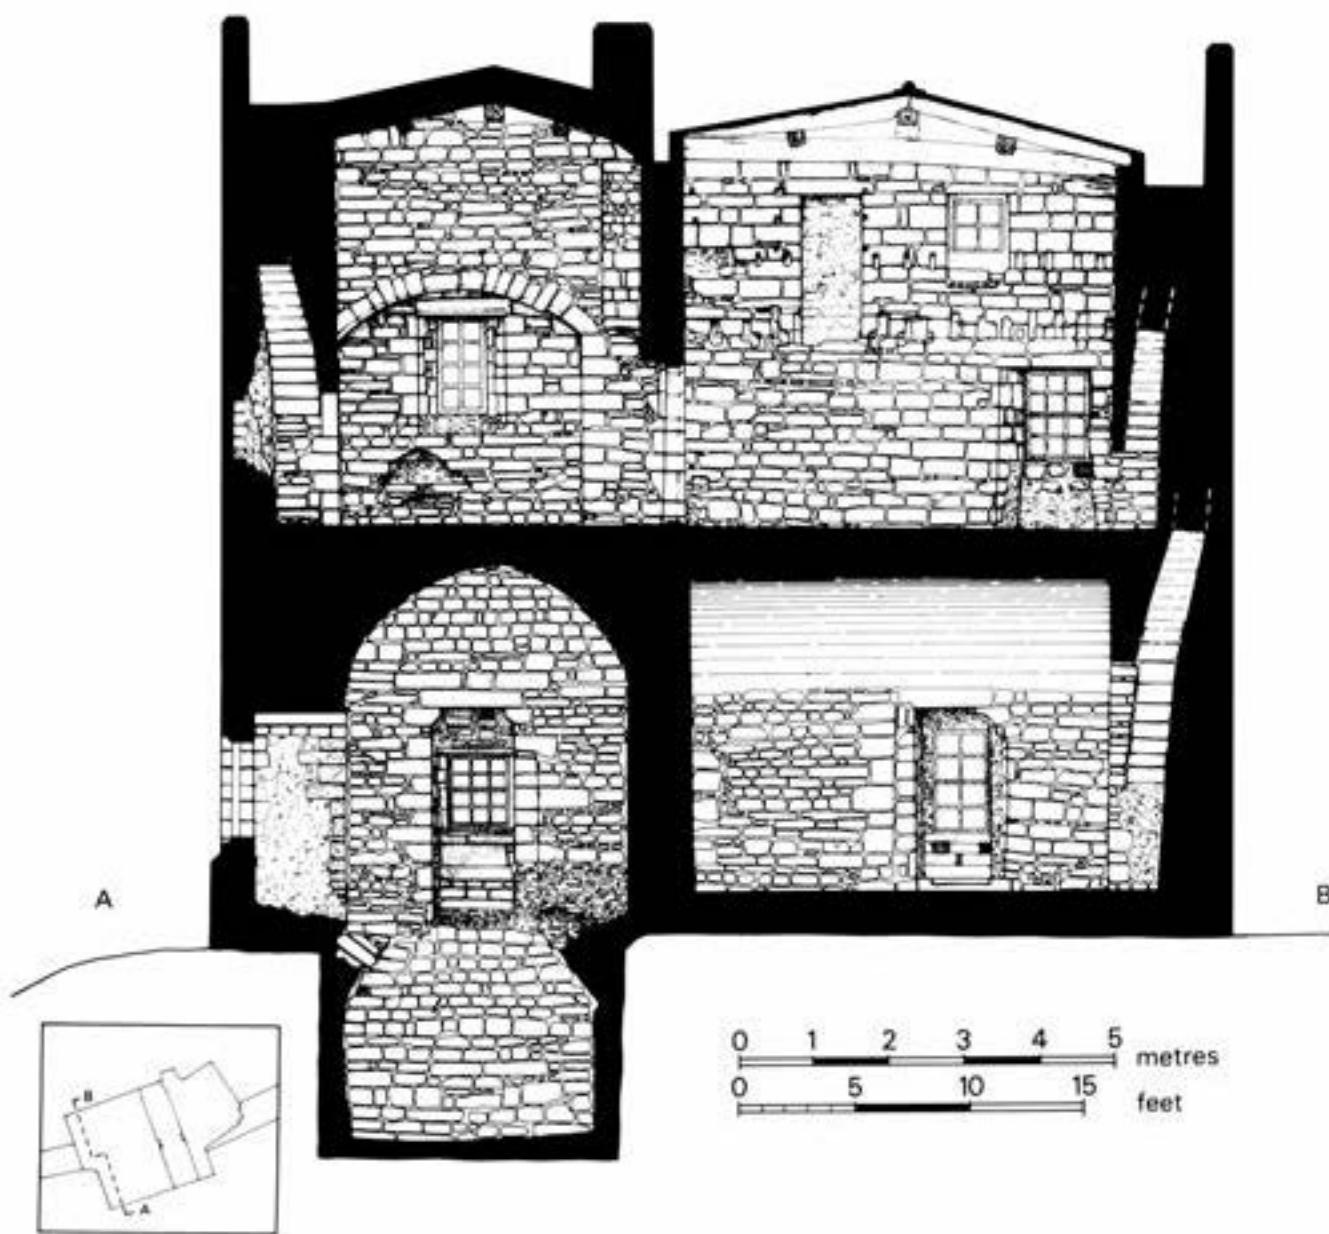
The outer gatehouse; internal north-south elevation of the west wall
